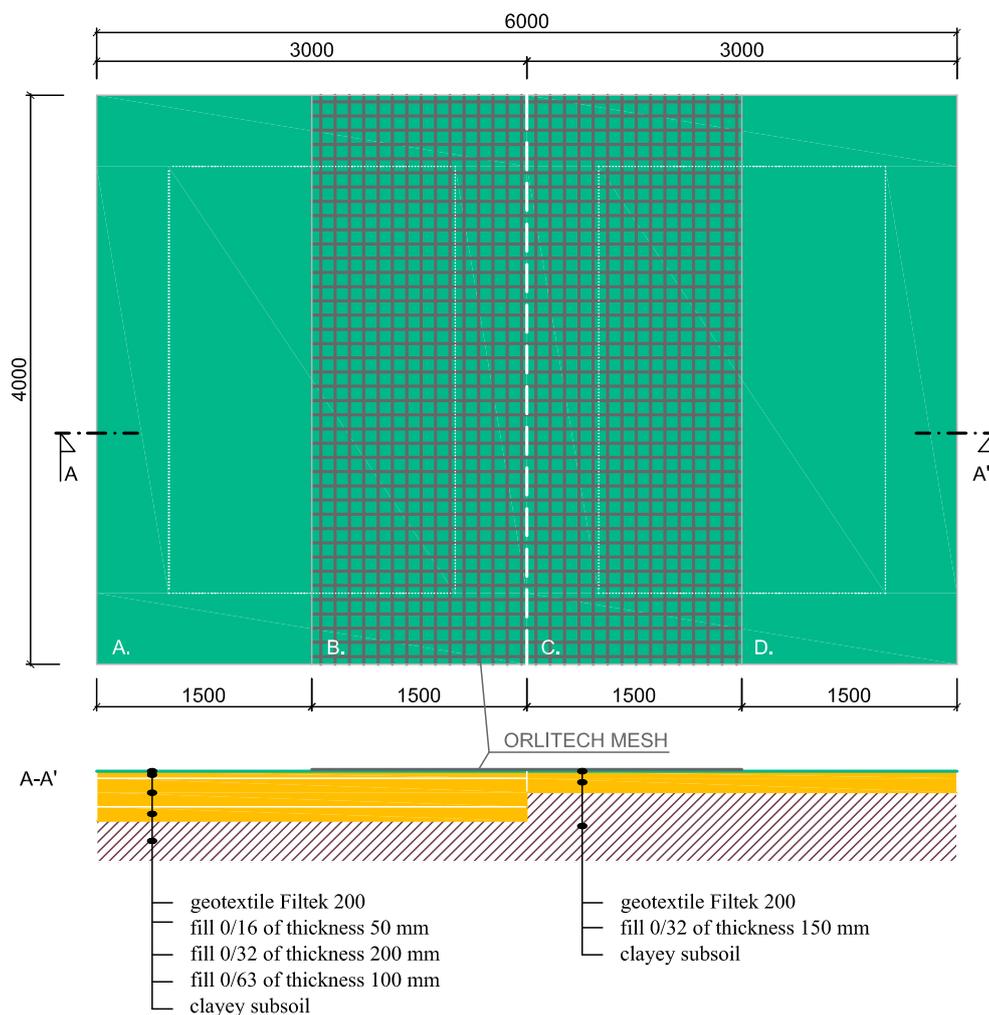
Testing field layout for the embankment and the subsoil (Dimensions in mm)
